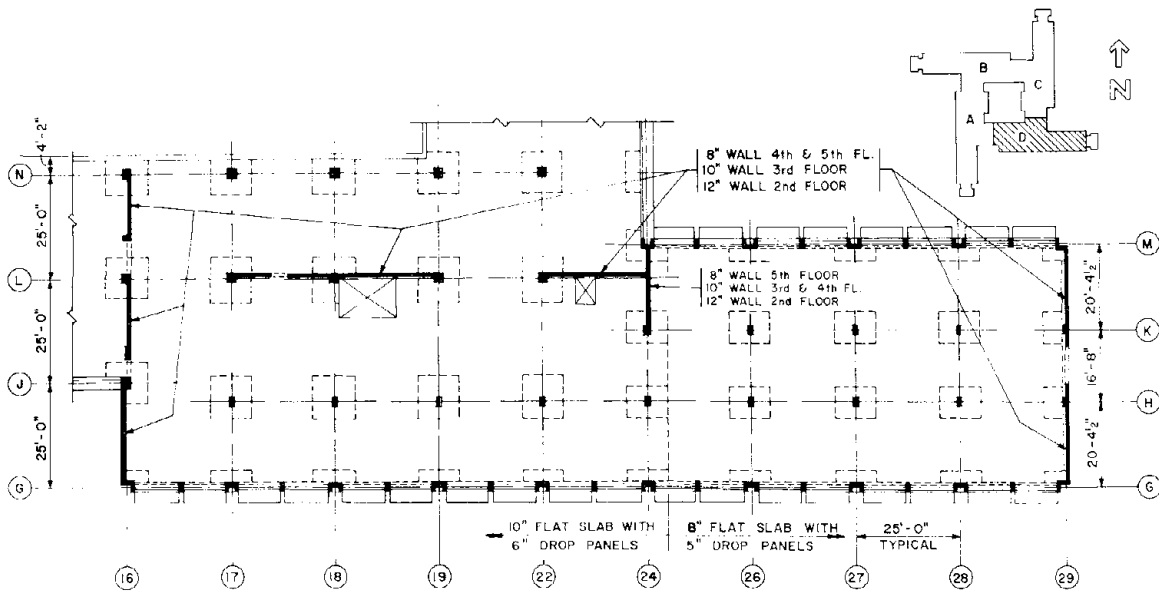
DETAIL OF WING D FLOOR PLAN FOR TYPICAL UPPER STORY (WING B SIMILAR)
